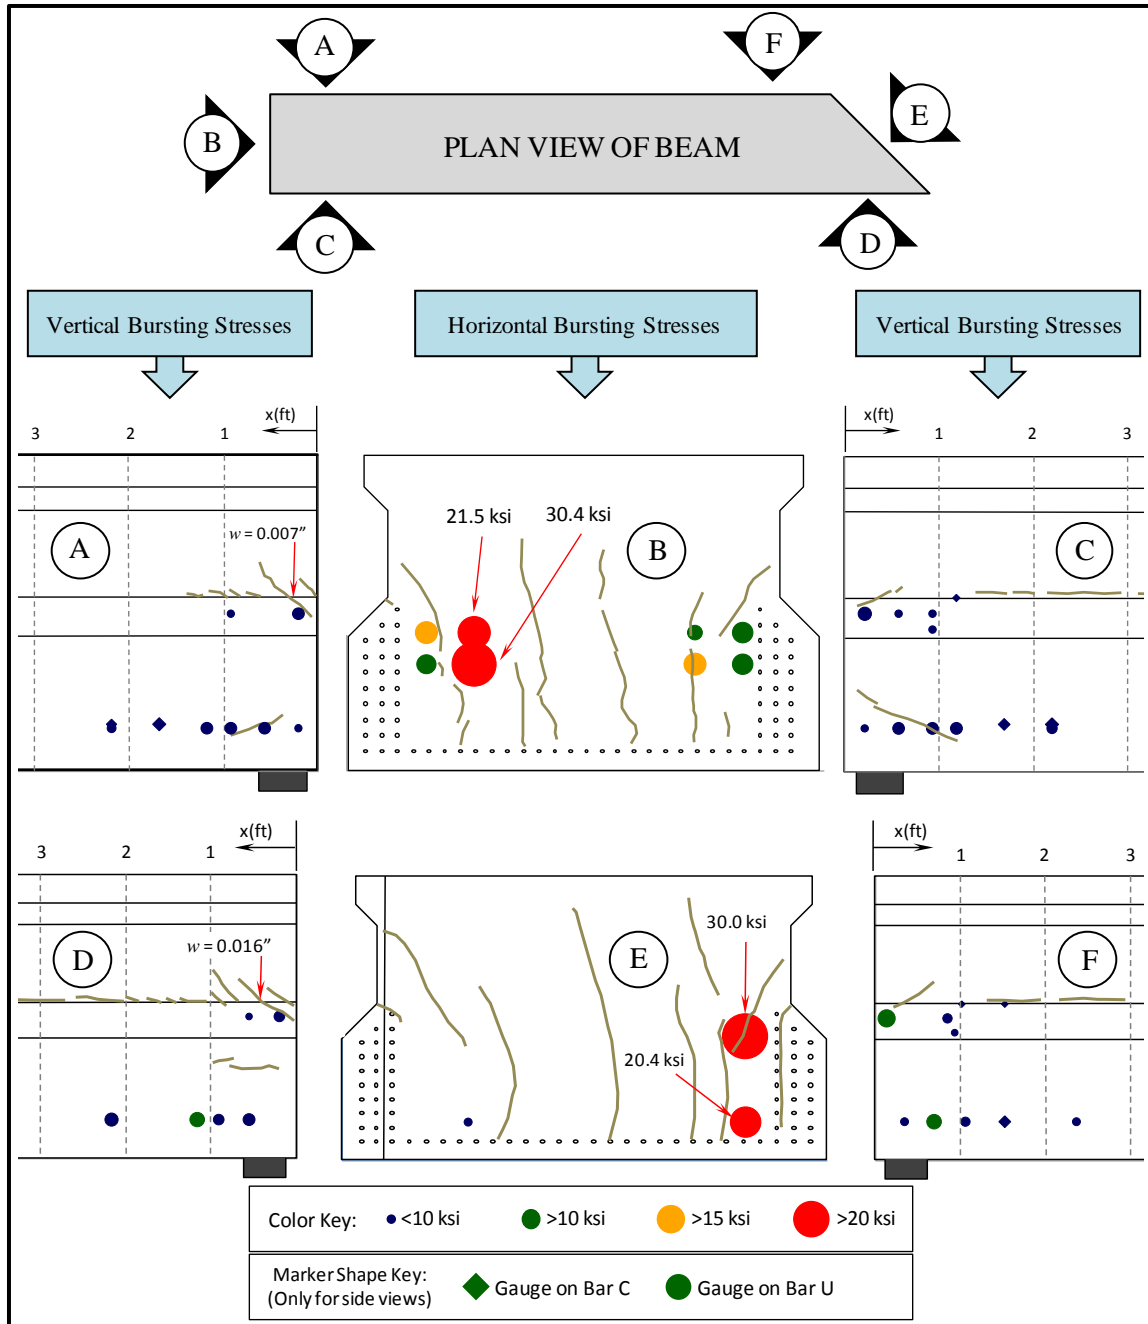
Cracks and stresses registered at the time of prestress transfer in beam specimen 5B40-2
